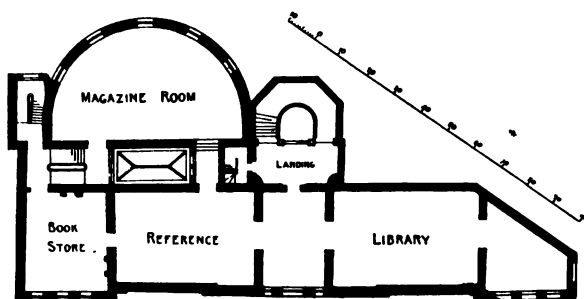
Plan of the first floor of the Newcastle-upon-Tyne, Public Library.
